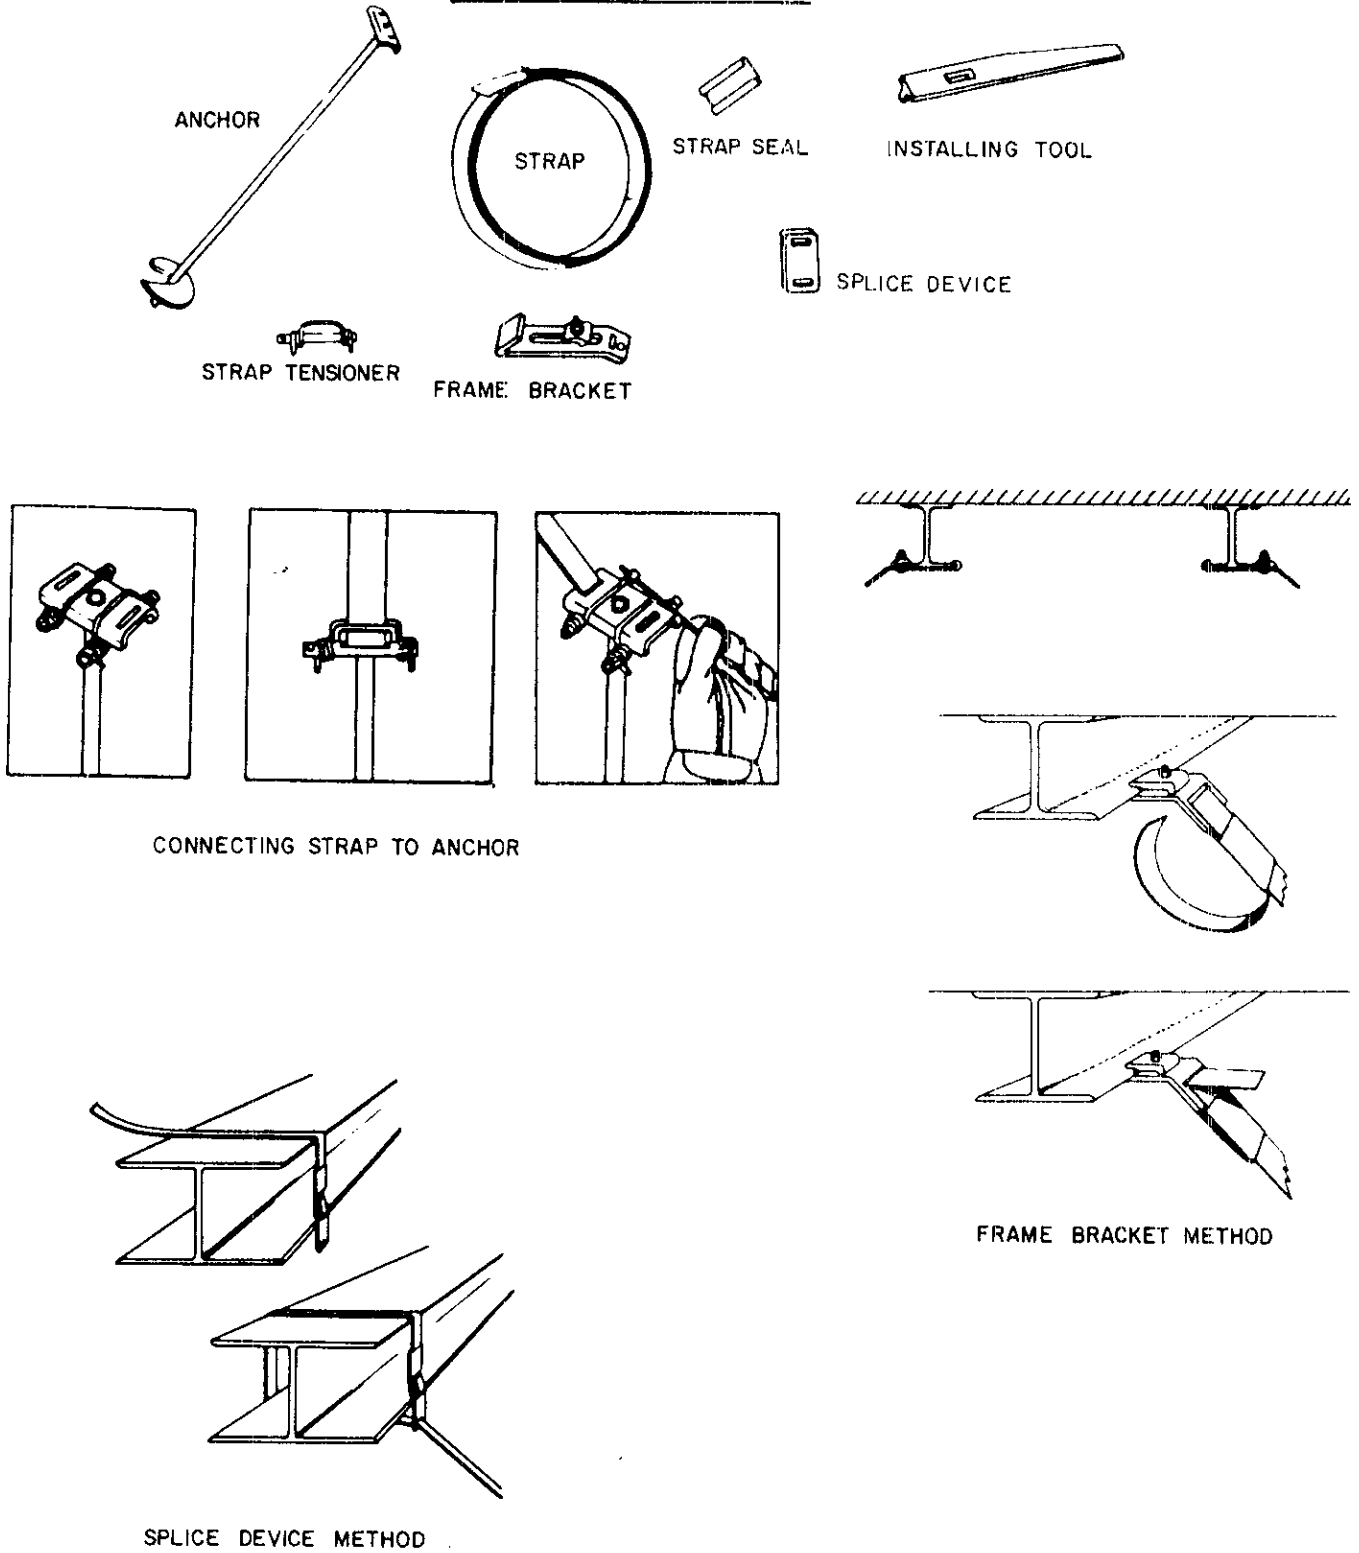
Anchoring system equipment. (Reference 18, 30).
